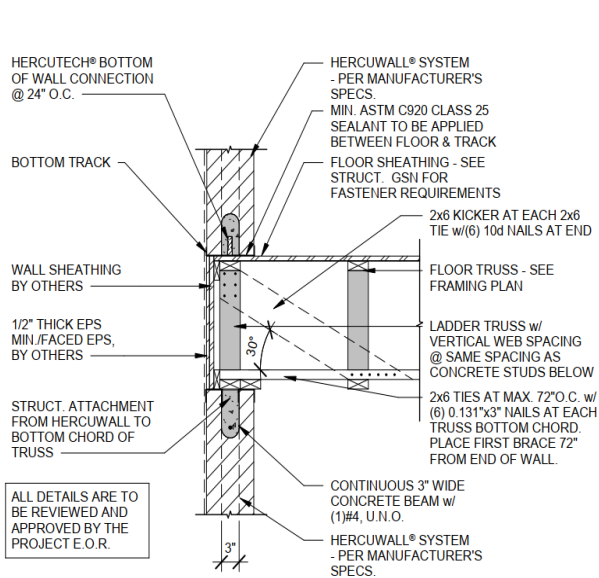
Typical HercuWall® CFC Box Beam Wall Construction Concrete Option
